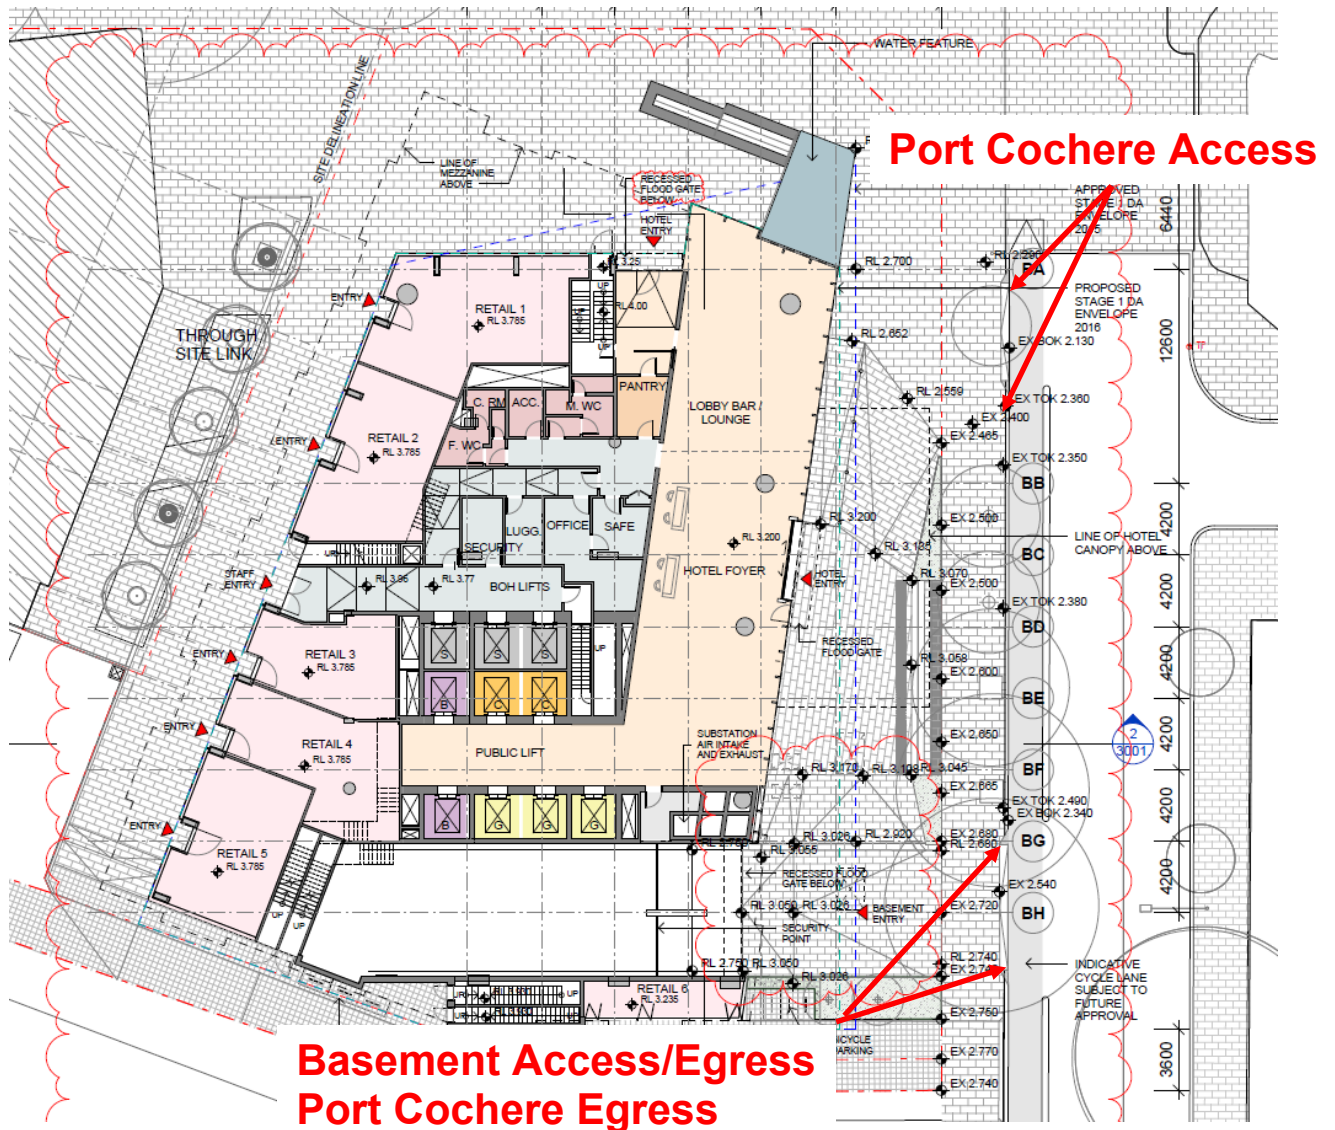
Ground floor plan, highlighting vehicular access/egress points to the shared basement and porte cochere
